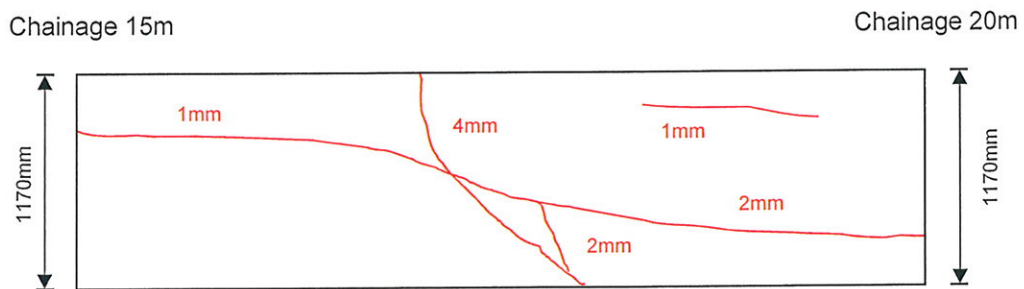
Wall Height, Crack Locations and Sizes for Chainages 15m to 20m
